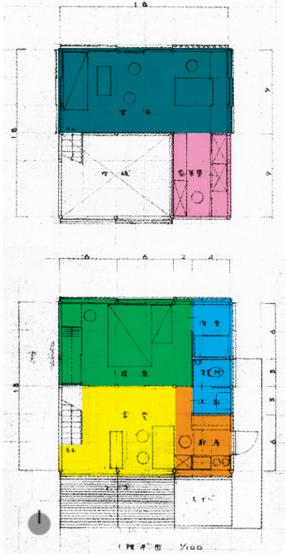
Minimum House floor plans (left) Image: The Japanese House p 044 Additional illustration: Daniel Vu
